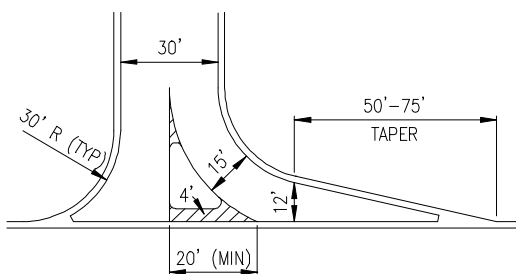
DETAIL B: TYPICAL TWO-WAY DRIVEWAY
